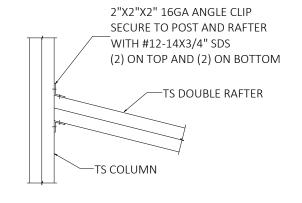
A LEAN TO RAFTER/COLUMN CONNECTION FOR RAFTER SPANS LESS THAN 12'-0"
